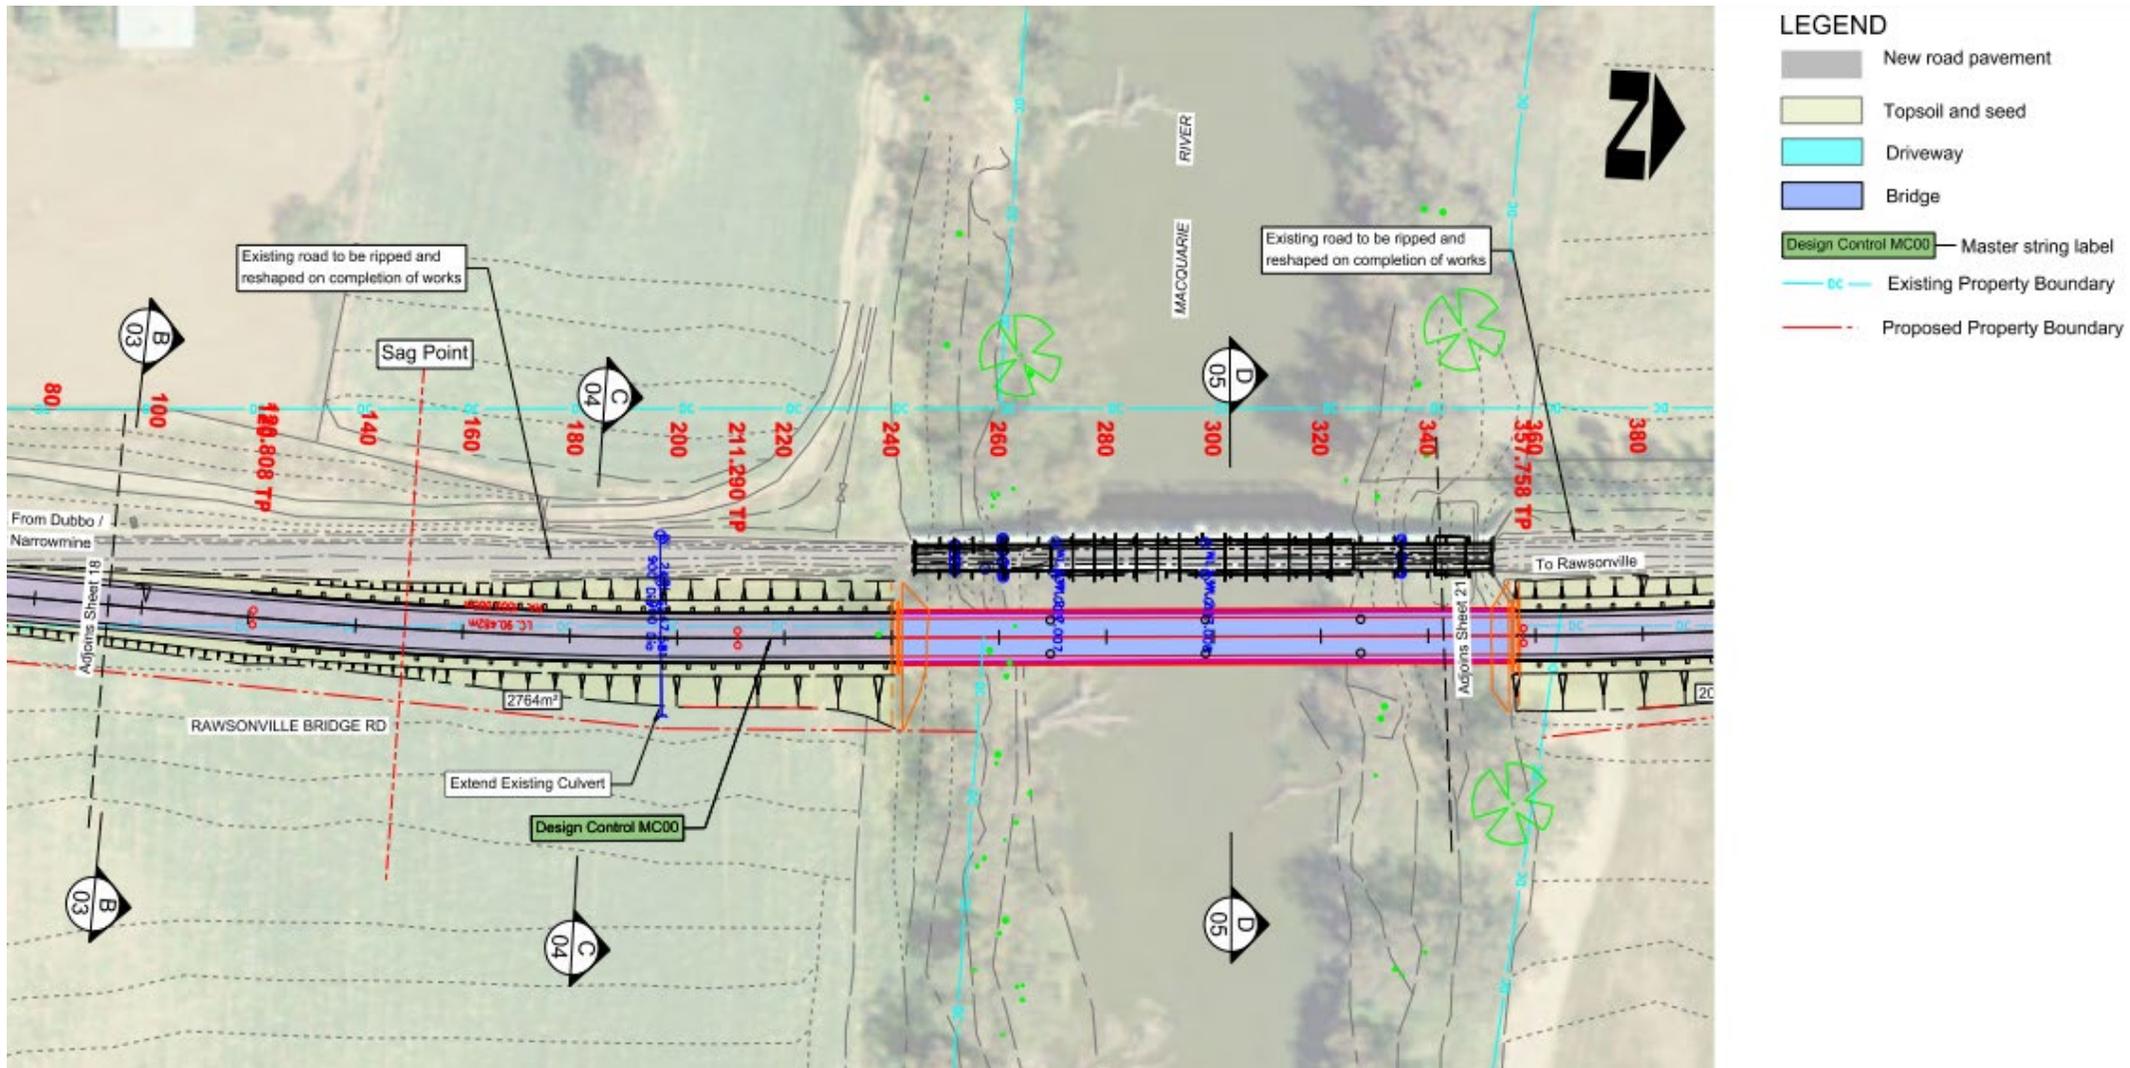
New bridge southern approach. Source: CCHD (final design)
